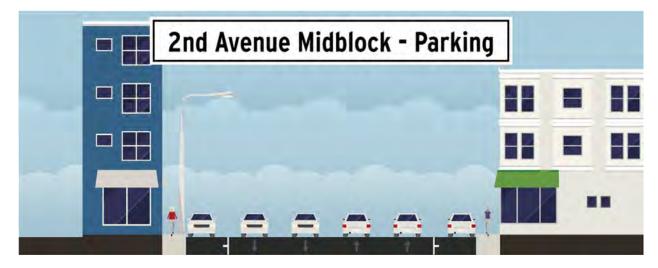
2nd Avenue Midblock with Parking Cross Section
